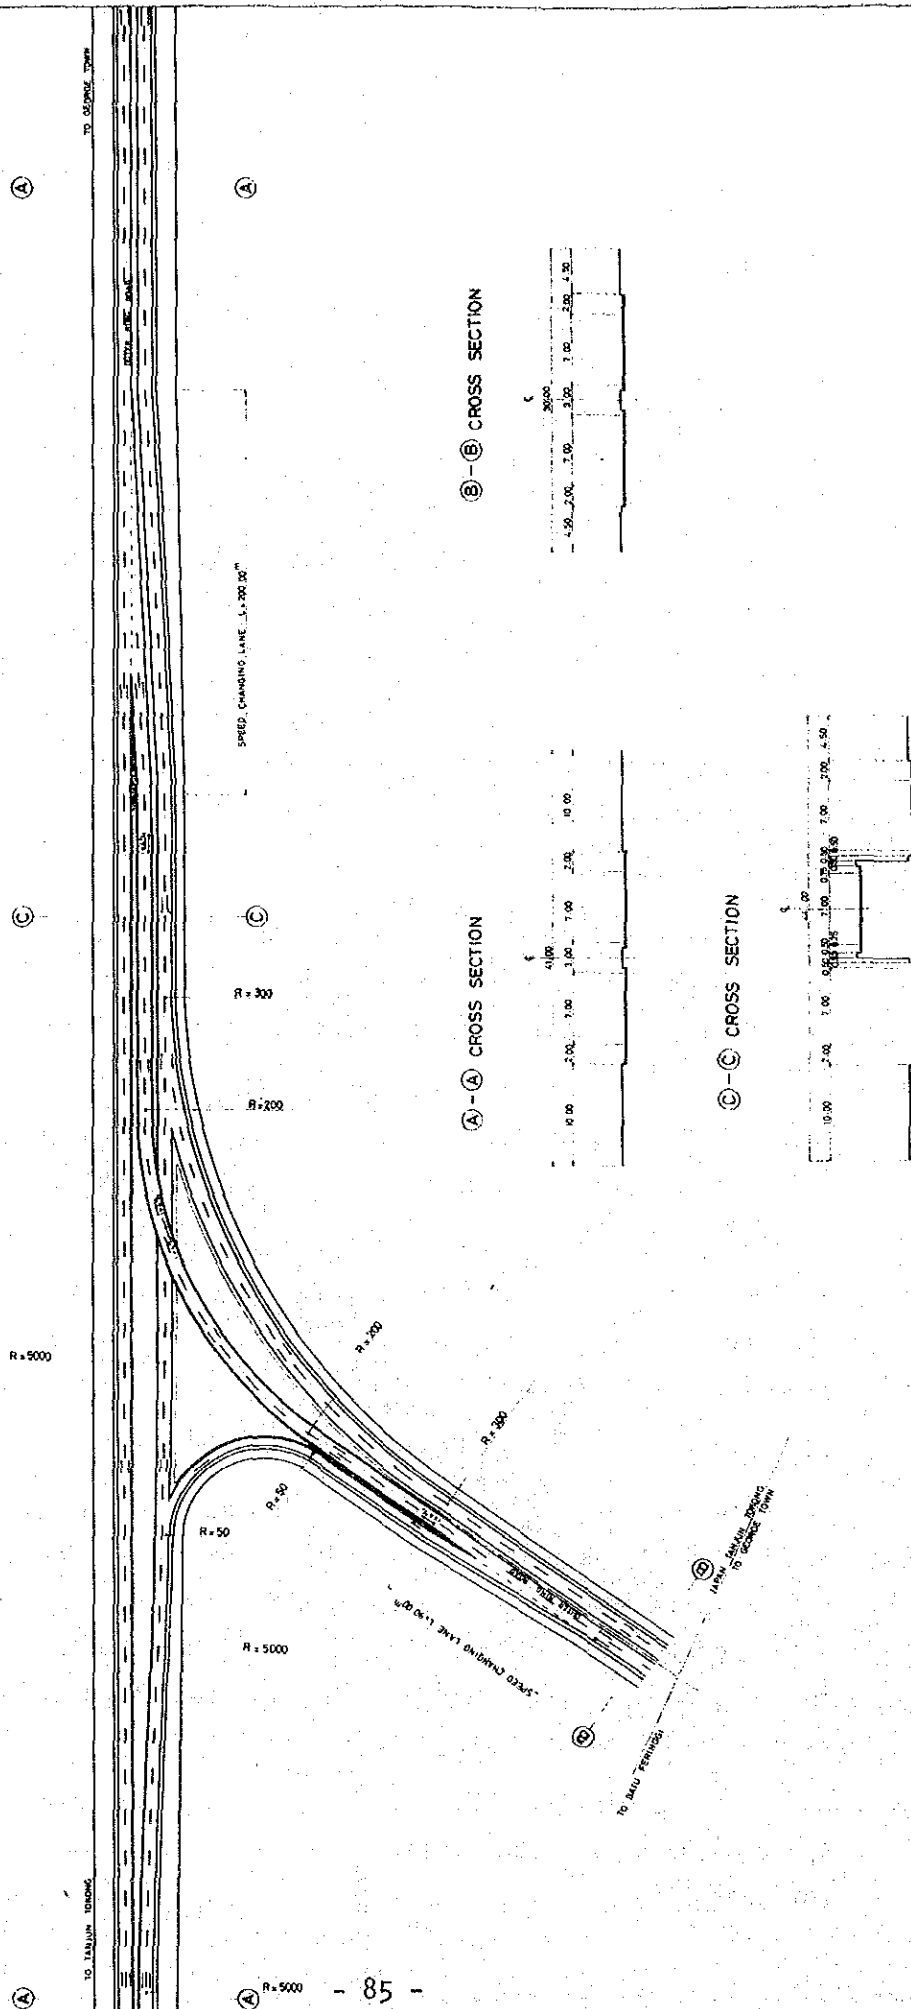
GRADE SEPARATION PLAN (STA 145')
